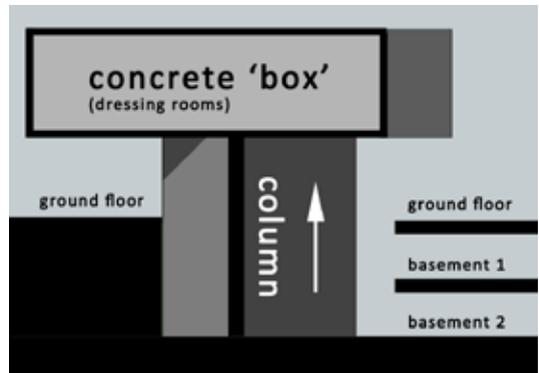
sectional diagram reinforced concrete column supporting dressing room area.
